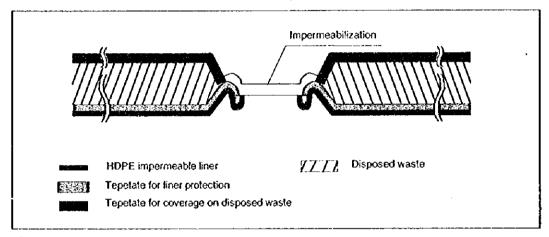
Impermeabilization of 0.0 Meter Elevation Roads
